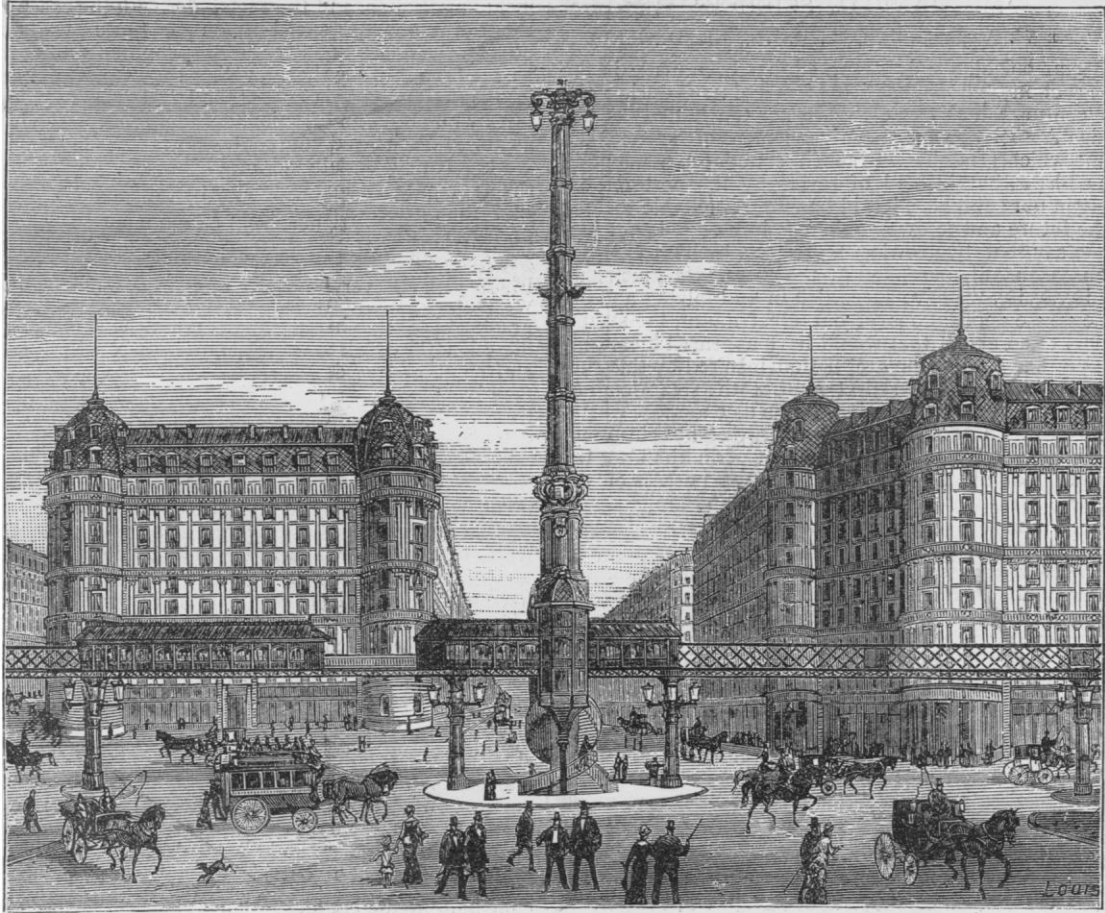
ELECTRIC ELEVATED RAILROAD FOR THE BOULEVARDS OF PARIS. PLAN OF M. CHRÉTIEN. VIEW OF A STATION.
